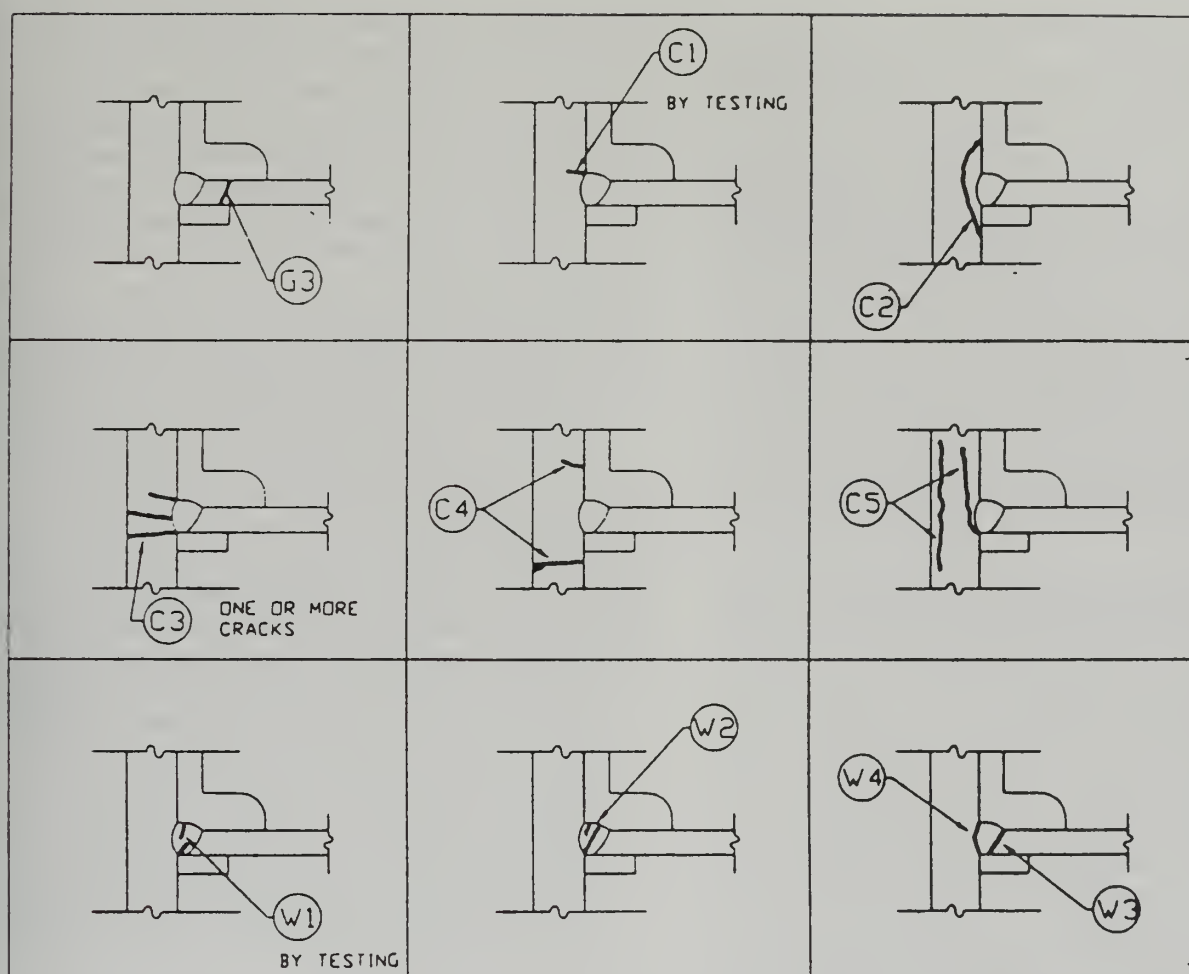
Types of damage found in beam-to-column connections in steel Special Moment Resisting Frame buildings. Type G3 illustrates brittle cracking, failure, or tearing of the beam web. Types W3 and W4 illustrate failure adjacent to the complete joint penetration beam flange-to-column flange weld, and types W1 and W2 illustrate failure within the complete joint penetration beam flange-to-column flange weld. Column damage is illustrated by Type C1–5.
